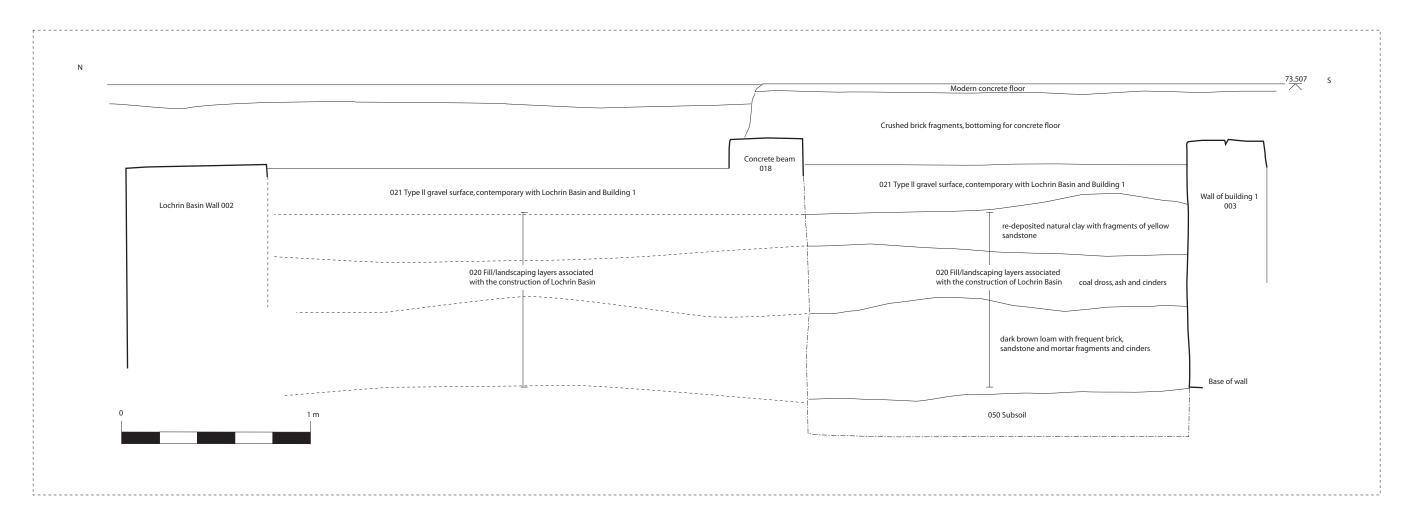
West facing section showing fill/landscaping deposits between walls 002 and 003
